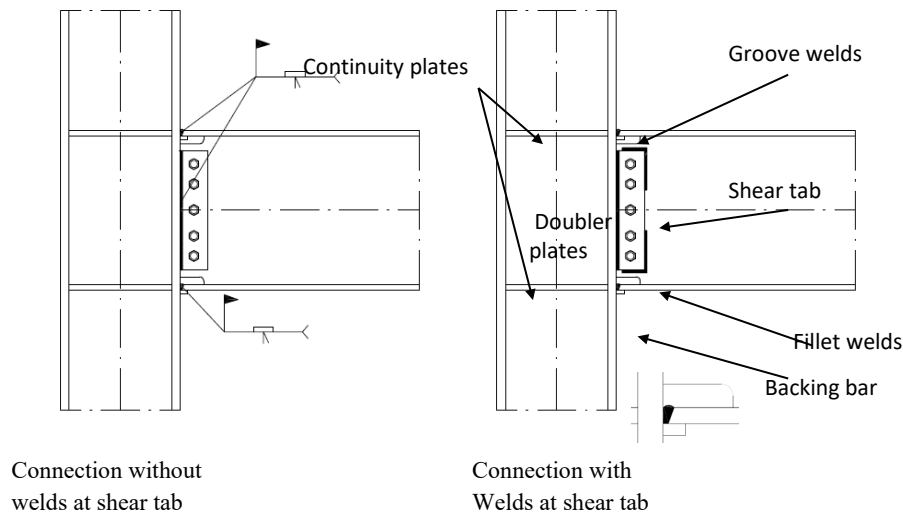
Typical US pre-Northridge flange welded-web bolted beam-column connection, with and without weld at shear plate, for welded steel moment frames
